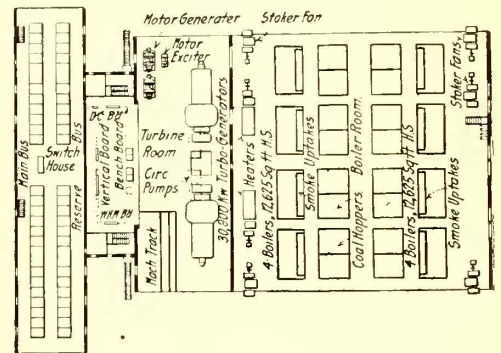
SIMPLIFIED PLAN OF WINDSOR PLANT SHOWING COMPLETE LAYOUT OF TWO UNITS OF STATION EQUIPMENT
